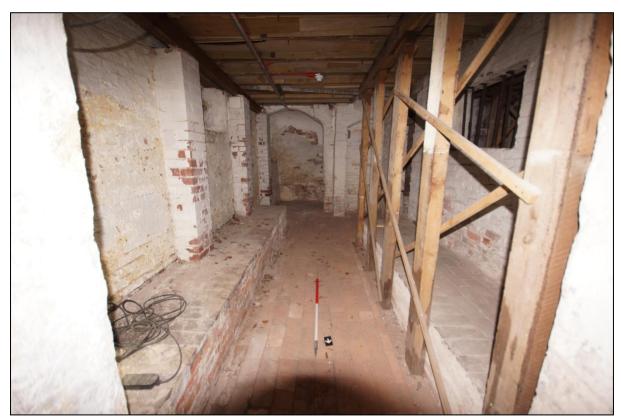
General view of Room C02, viewed looking south-west. Scale = 1m.
